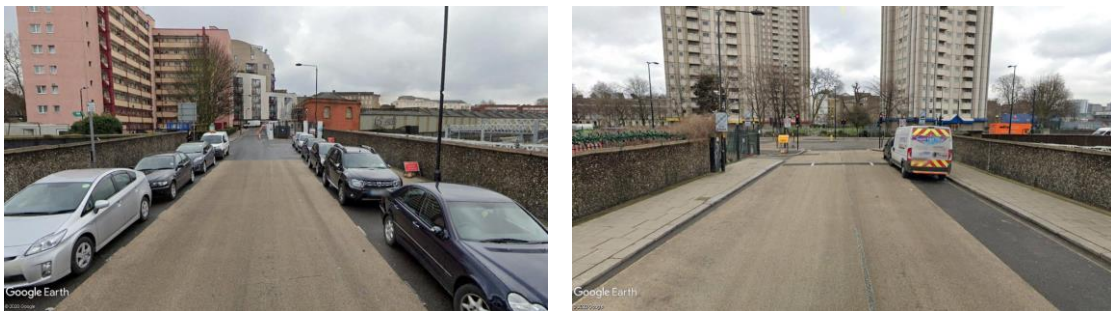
Street level views of existing Granby Terrace Bridge. Photos were taken from Google Maps in 2017. Construction works have since commenced on approved Bridge extension works (Source: Google Earth)
